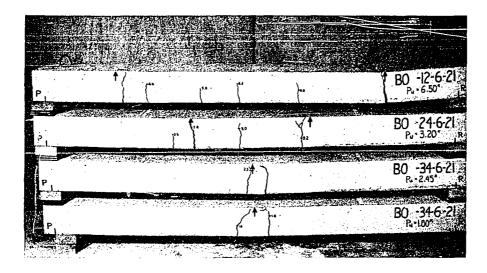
Typical shear-bond failures of beams constructed with deck O-20 gage. Each beam was 12 inches wide and 6 feet in length
